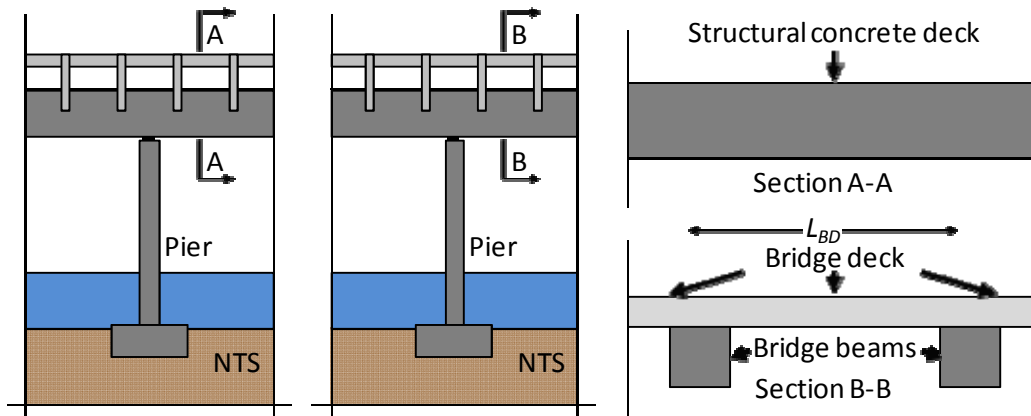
Bridge superstructure configuration a) a structural concrete deck, b) a bridge deck supported by concrete beams.
